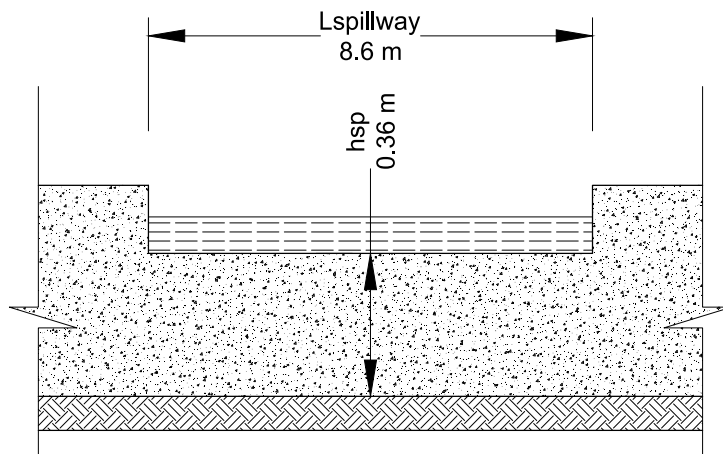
Longitudinal section of the designed spillway (AutoCAD)
